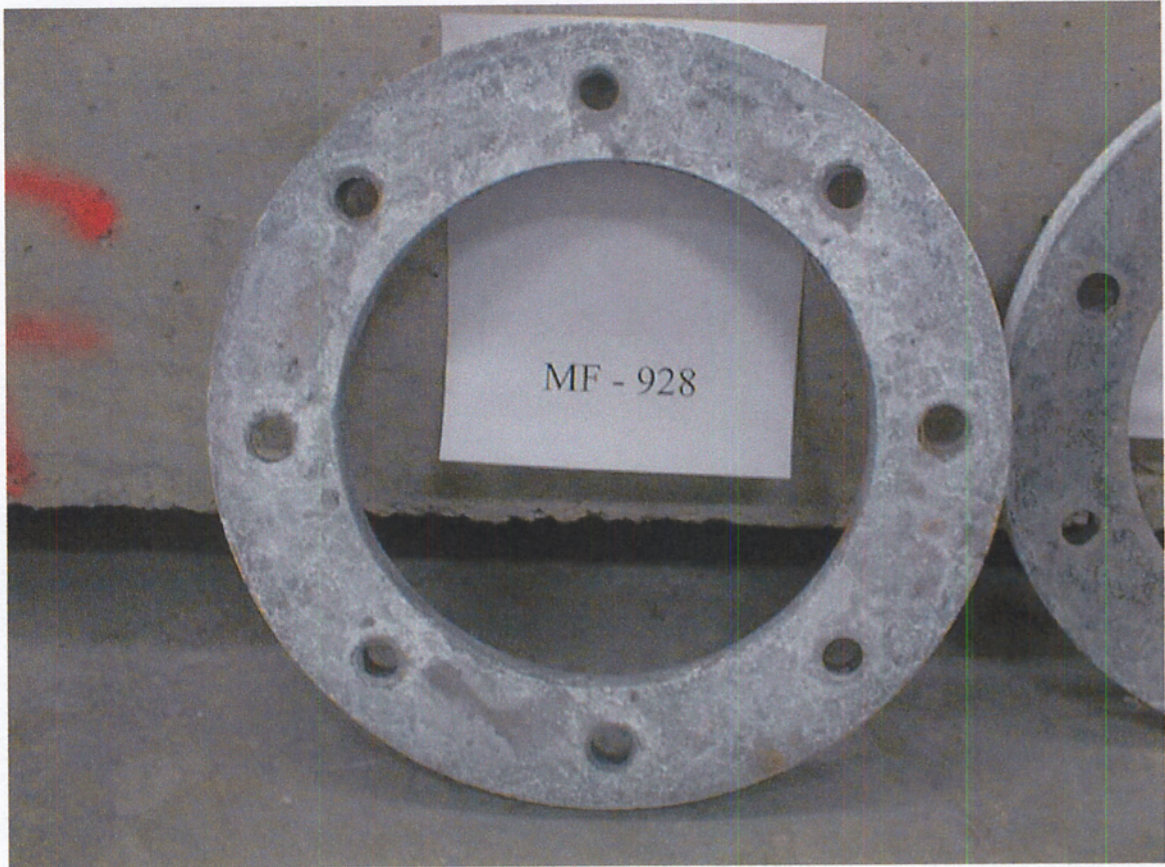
Picture Of Galvanized Plate From Base plate Assembly
